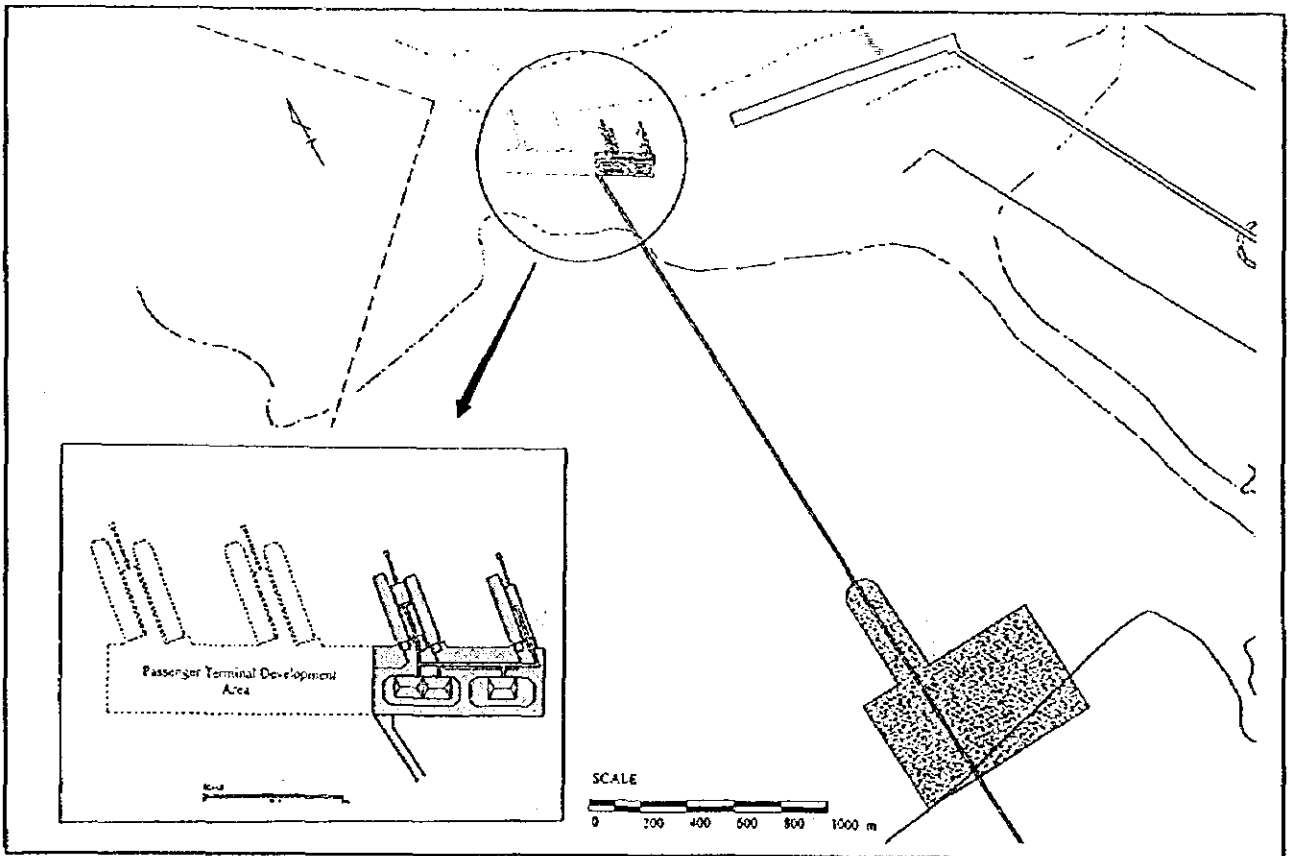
General Layout Plan of Ferry Terminal (5,000 GRT, at Surabaya site)
